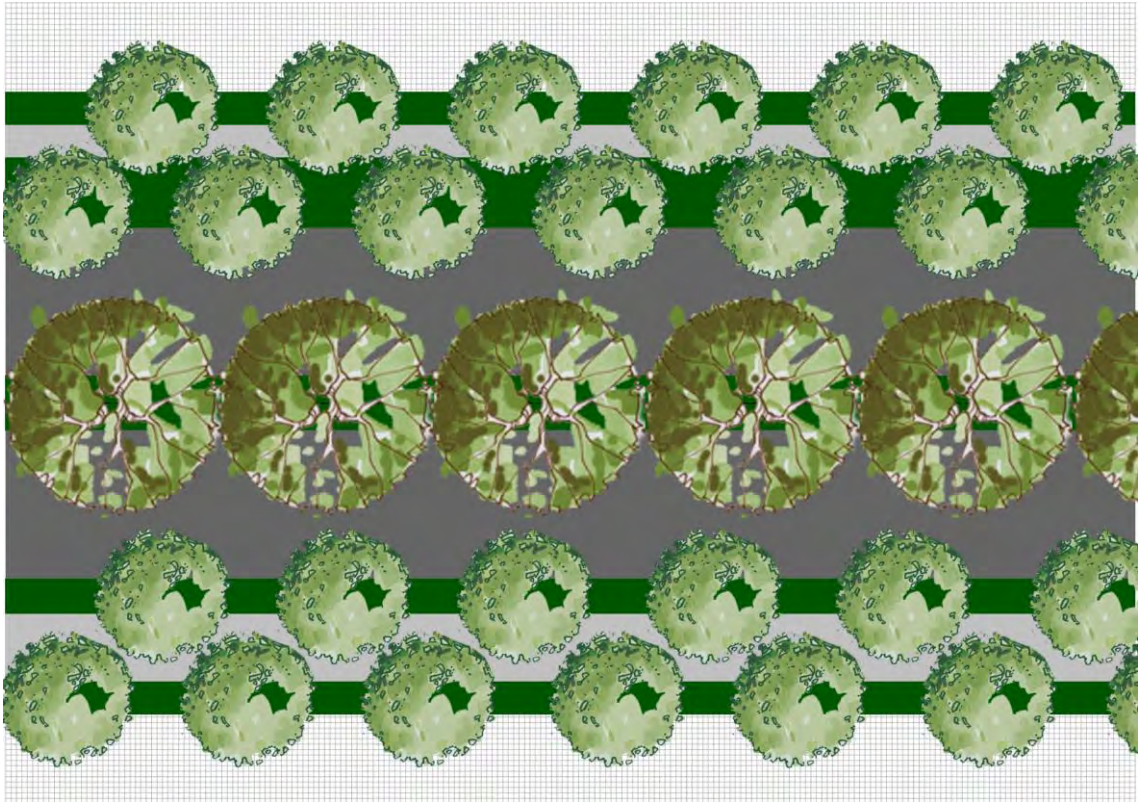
Continuous Street Tree Canopy - Entry Boulevard [5.0-5.5-2.0-5.5- 5.0]
